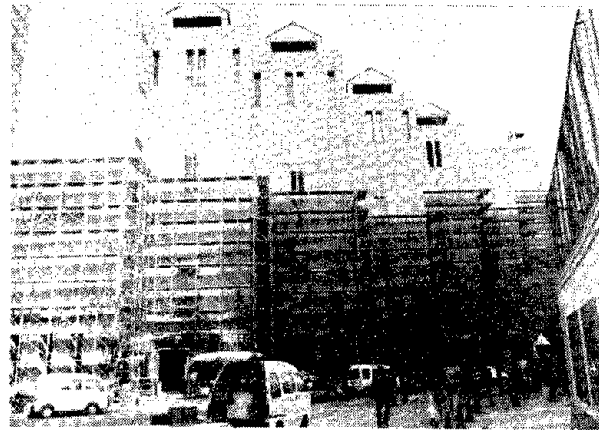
Shear cracking in reinforced concrete walls (behind scaffolding)
